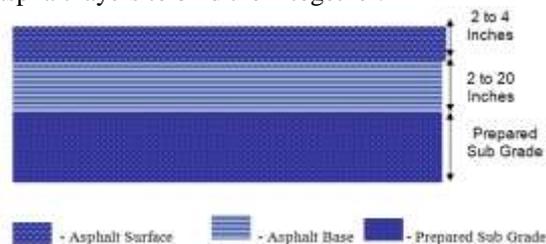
Typical Cross-Section of a Full-Depth Asphalt Pavement
